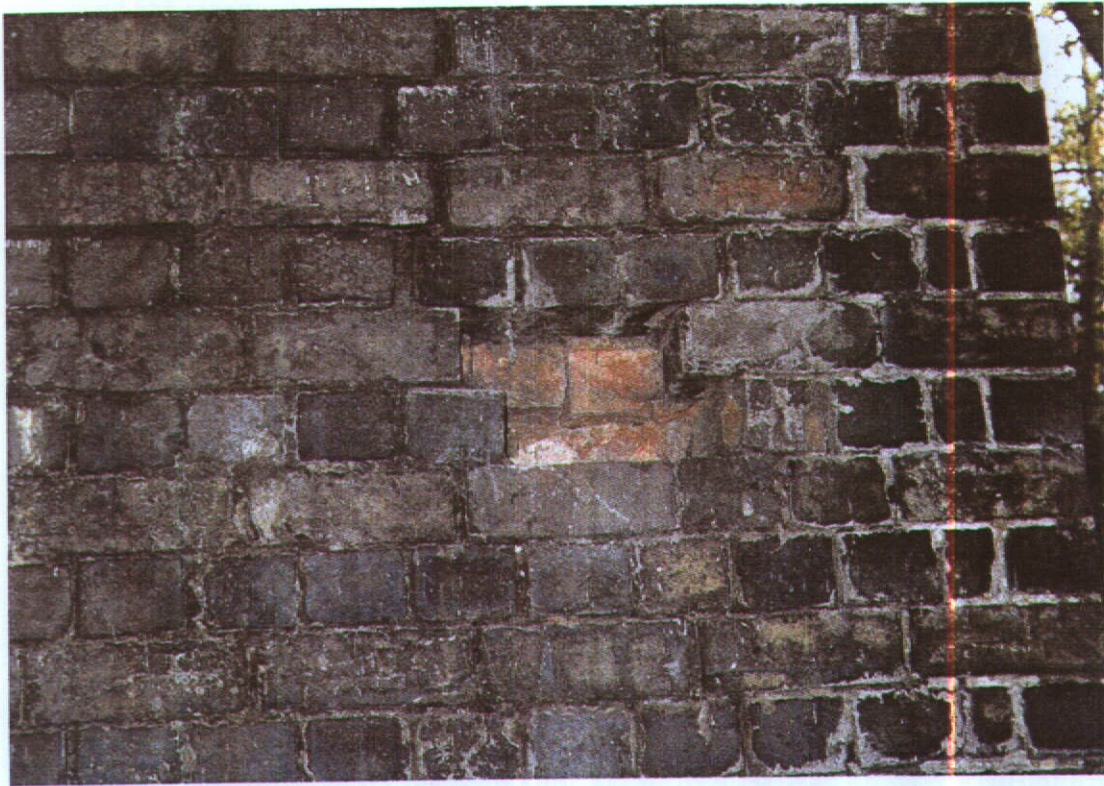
Damp and leaching to arch barrel no. 3 (south arch)
